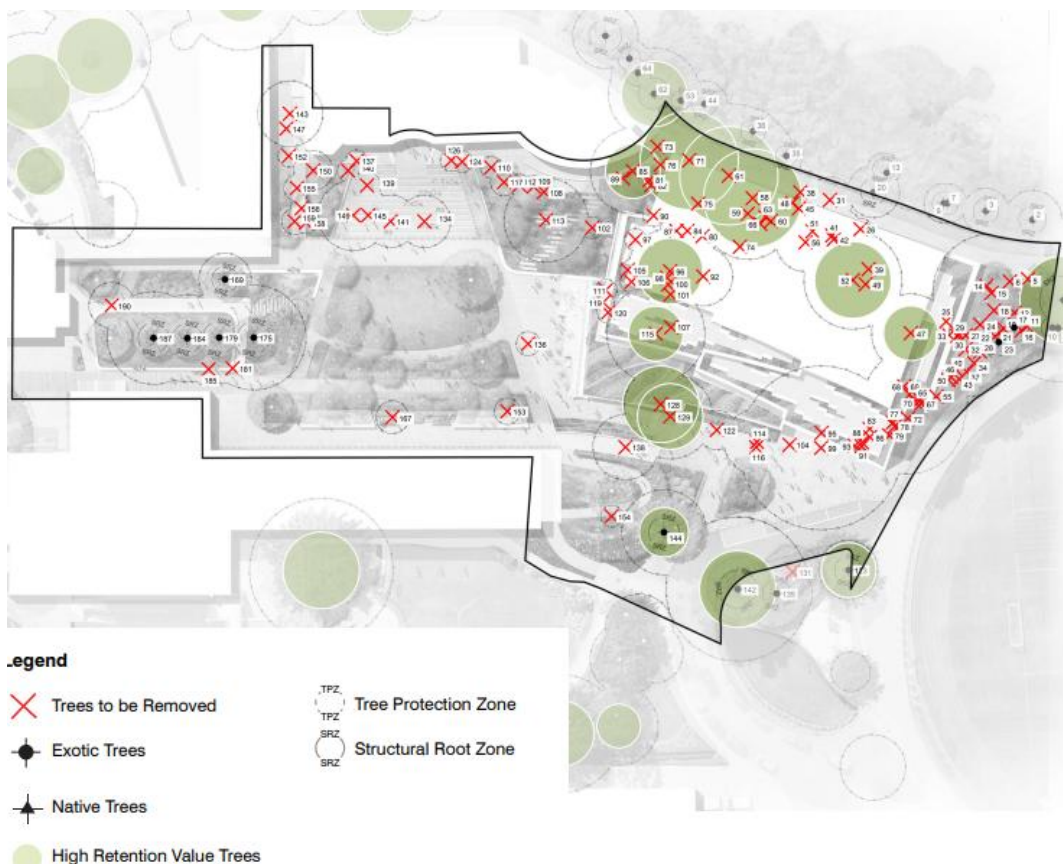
Existing trees to be retained/removed (source: T.C.L, Landscape Architecture Development Application Report)
